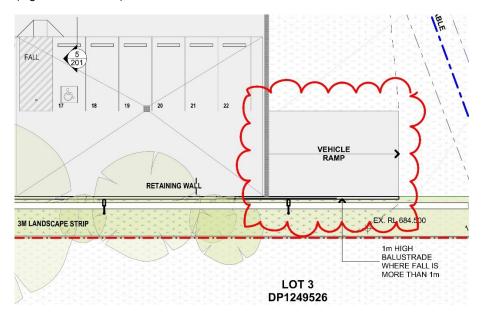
A: Extension of driveway adjacent to SES building and provision of a balustrade – s.4.55 Modification (source: F&J Tepa)
